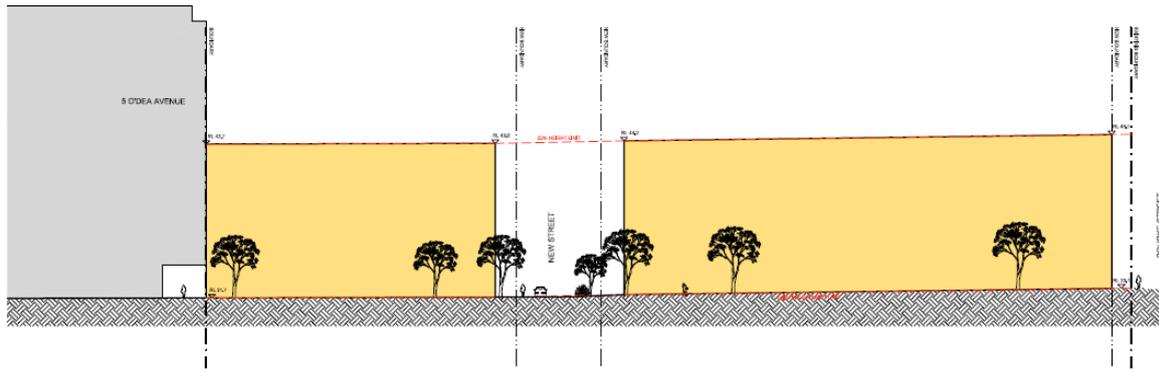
Elevation of the proposed envelopes from O'Dea Avenue
